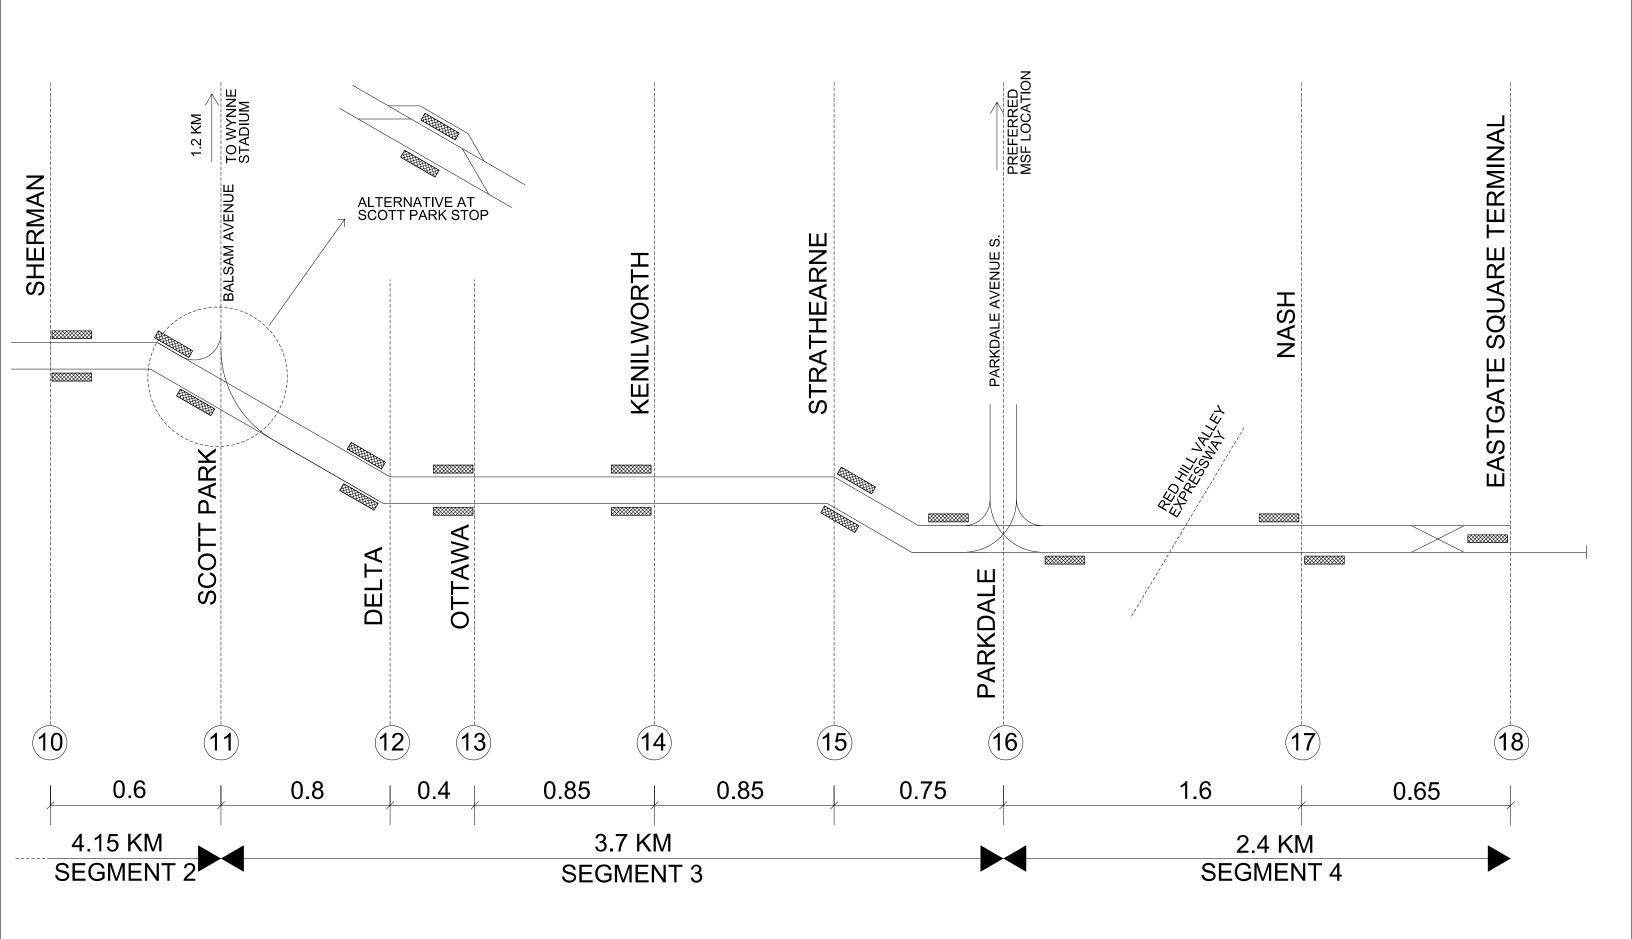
PROPOSED TRACK PLAN (PART 2)
